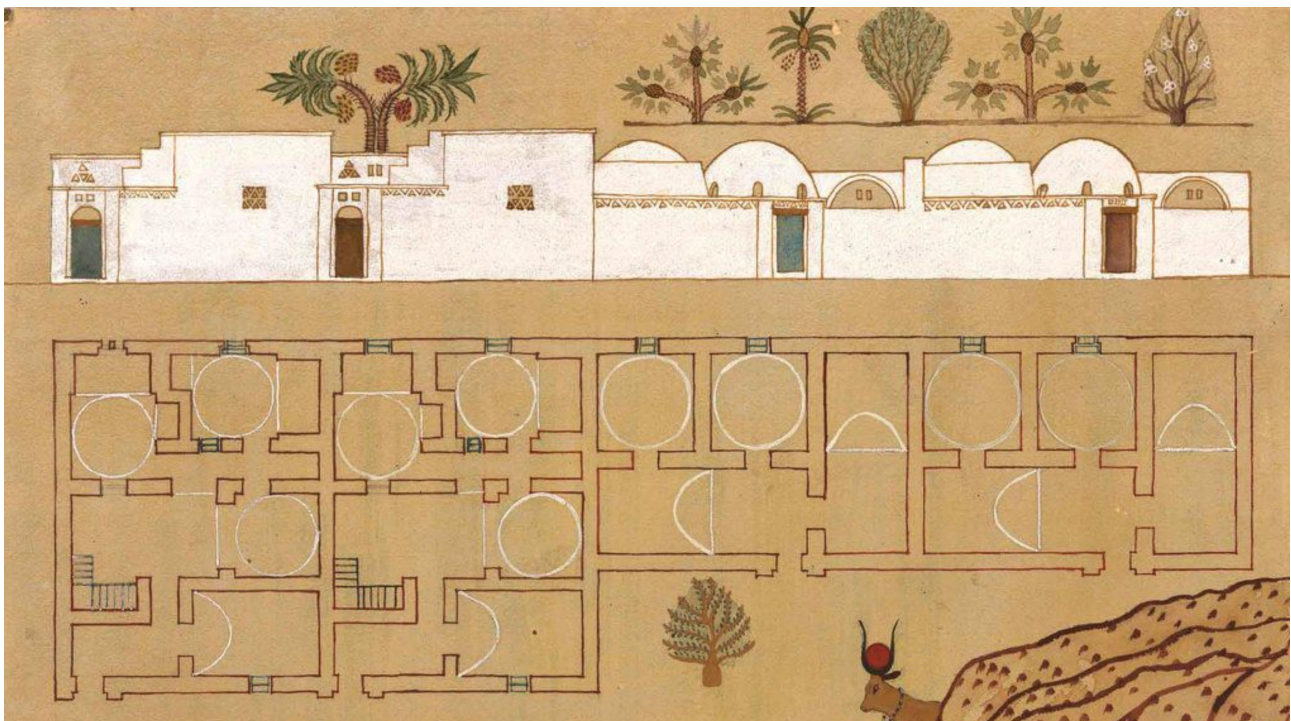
Example floor plan and building scheme for a traditionally constructed house in New Gourna, Egypt [4, p. 275].
